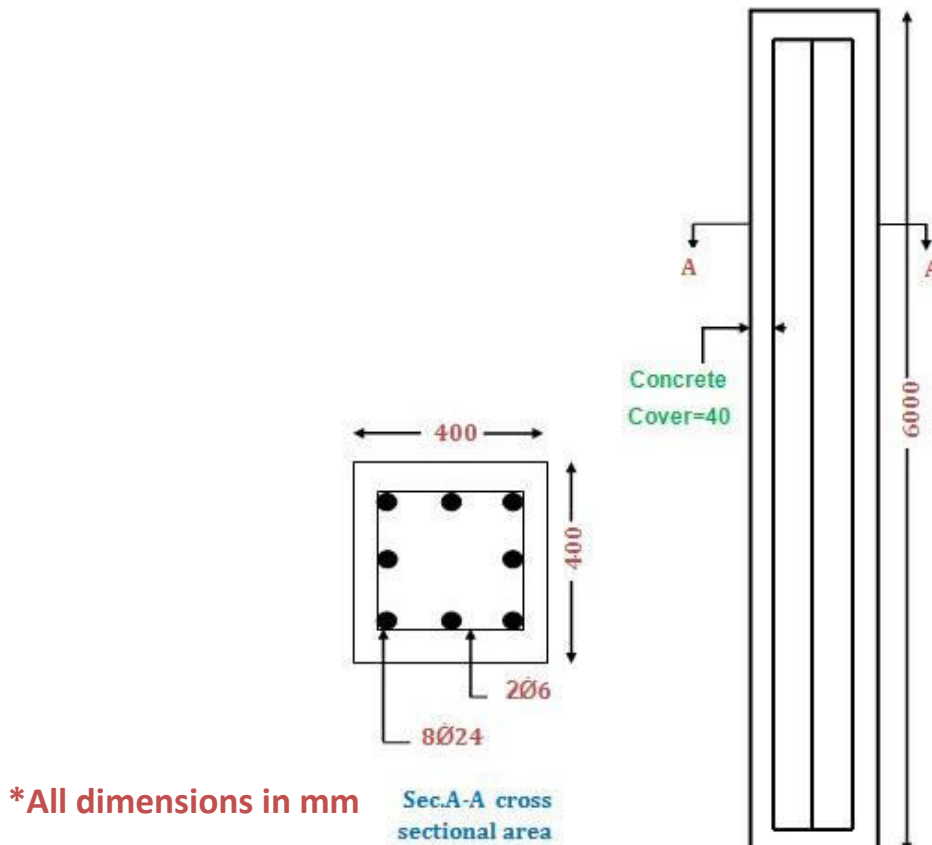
Details of (E80-C) RC Column (Hamed & Lai, 2016).
